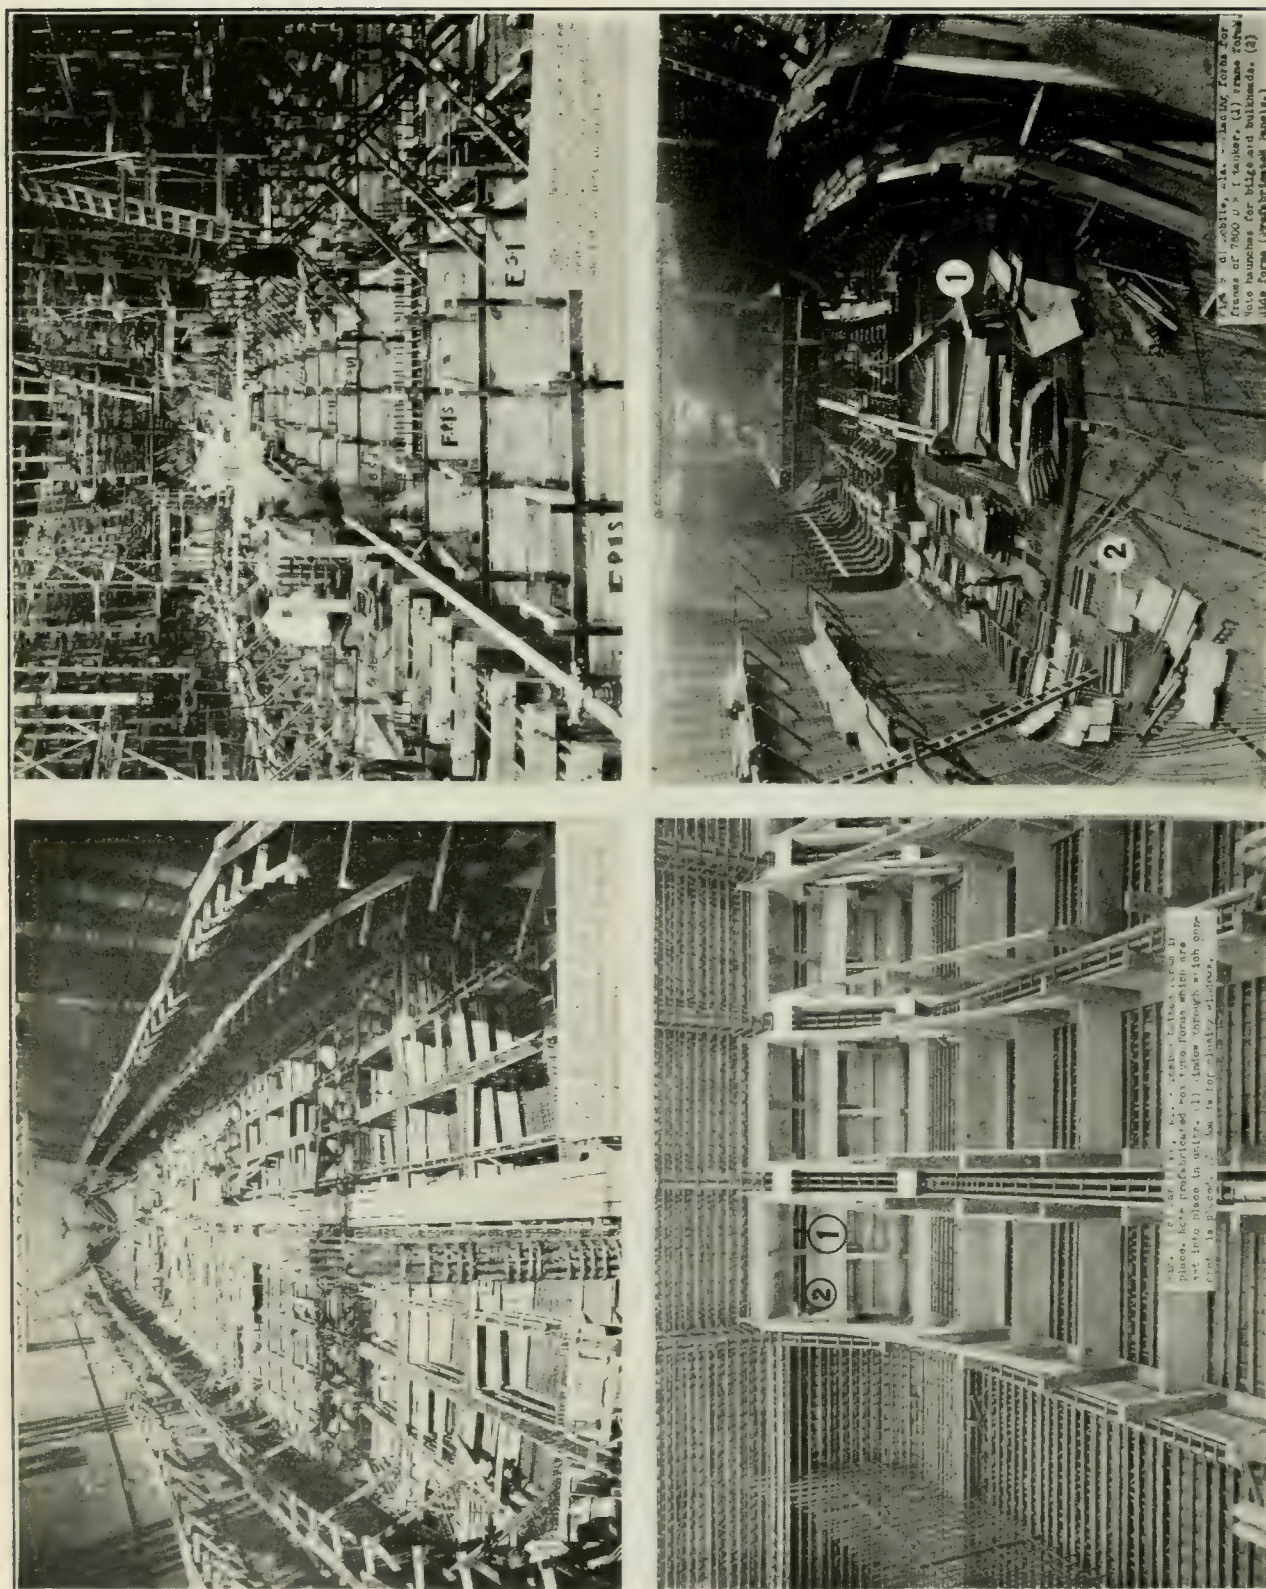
INSIDE FRAME KEELSON AND SIDE SHELL FORMS ERECTED TO THE HEIGHT OF FOUR OR FIVE FEET.
